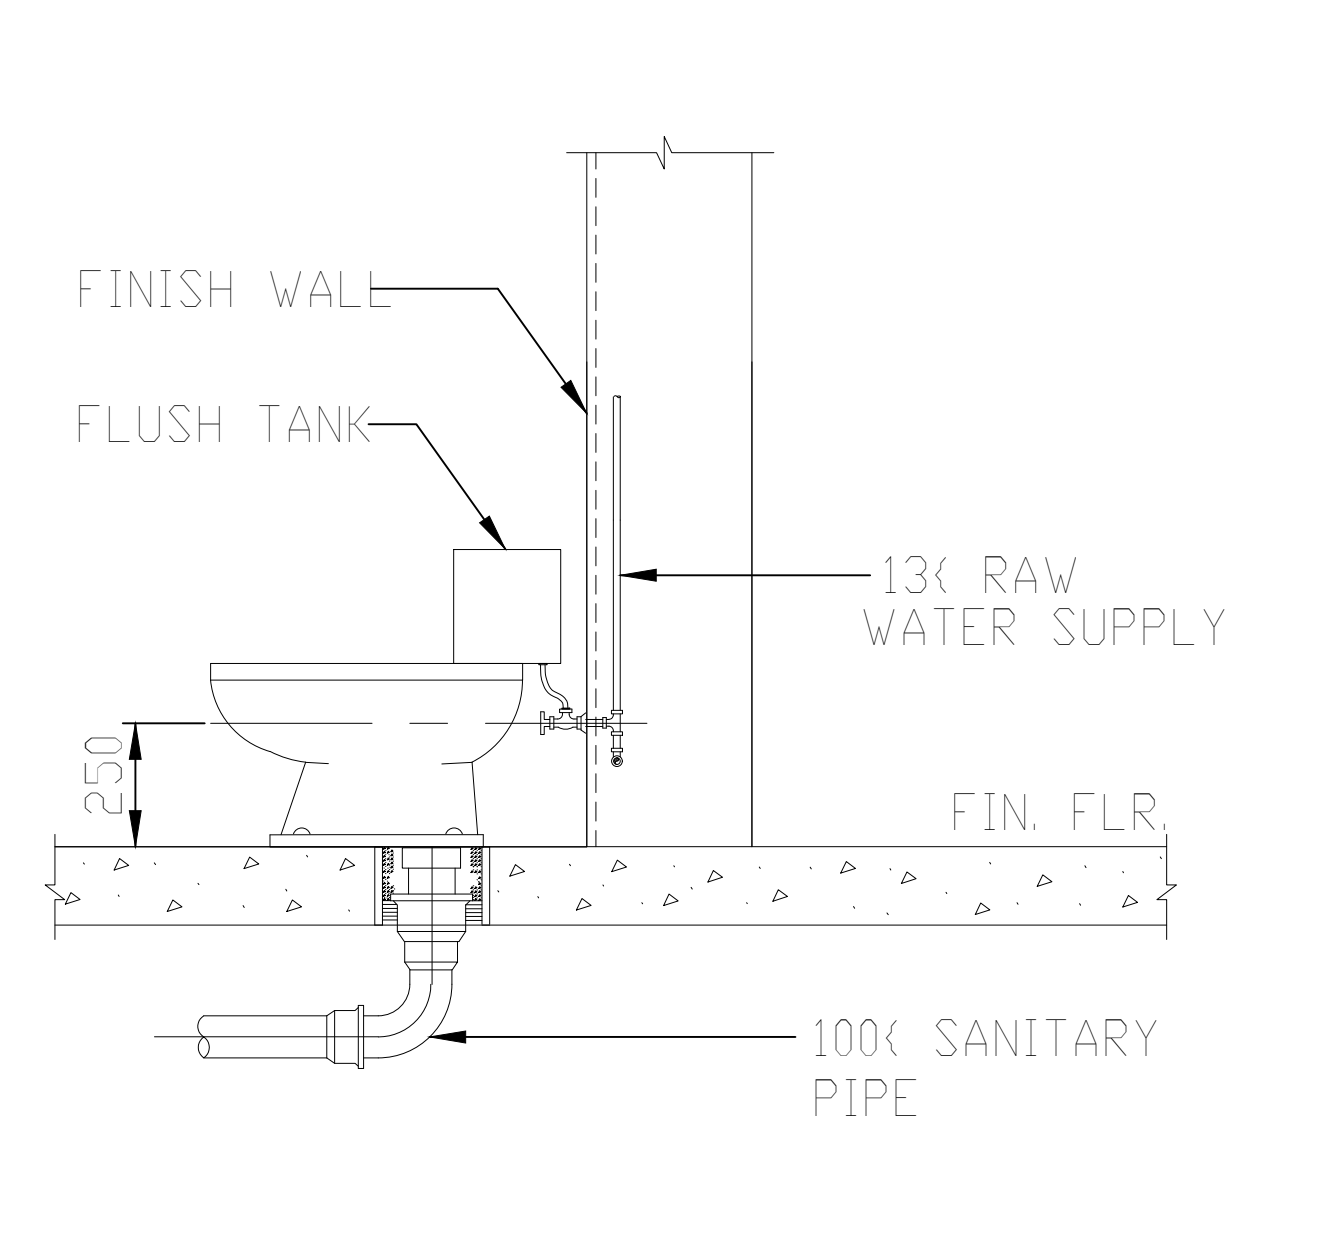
WATER CLOSET INSTALLATION DETAIL
